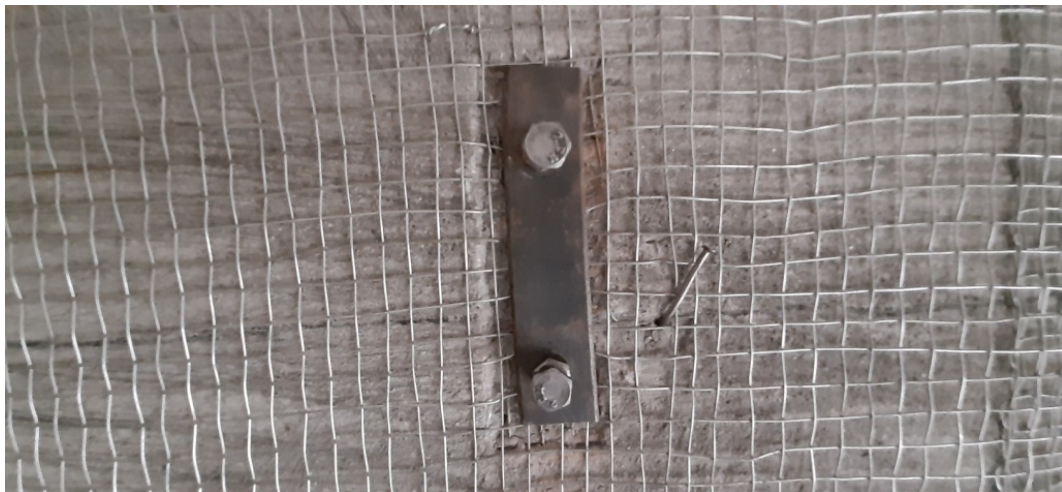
Flat bar, rawl bolt and nut bolt installation to connect existing brick and beam with wire mesh. This head of nut can be removed if possible/required.
